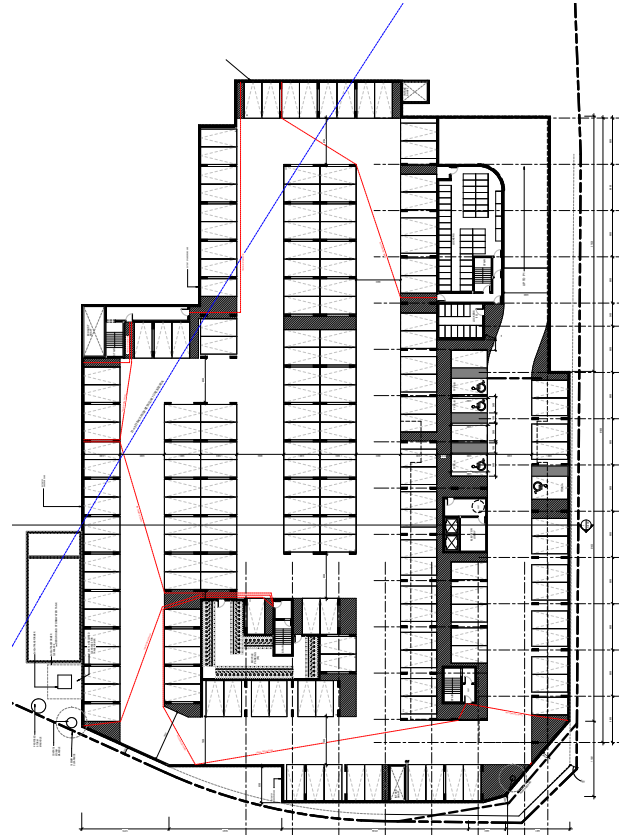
P2 Floor Plan of the Proposed Underground Parking
